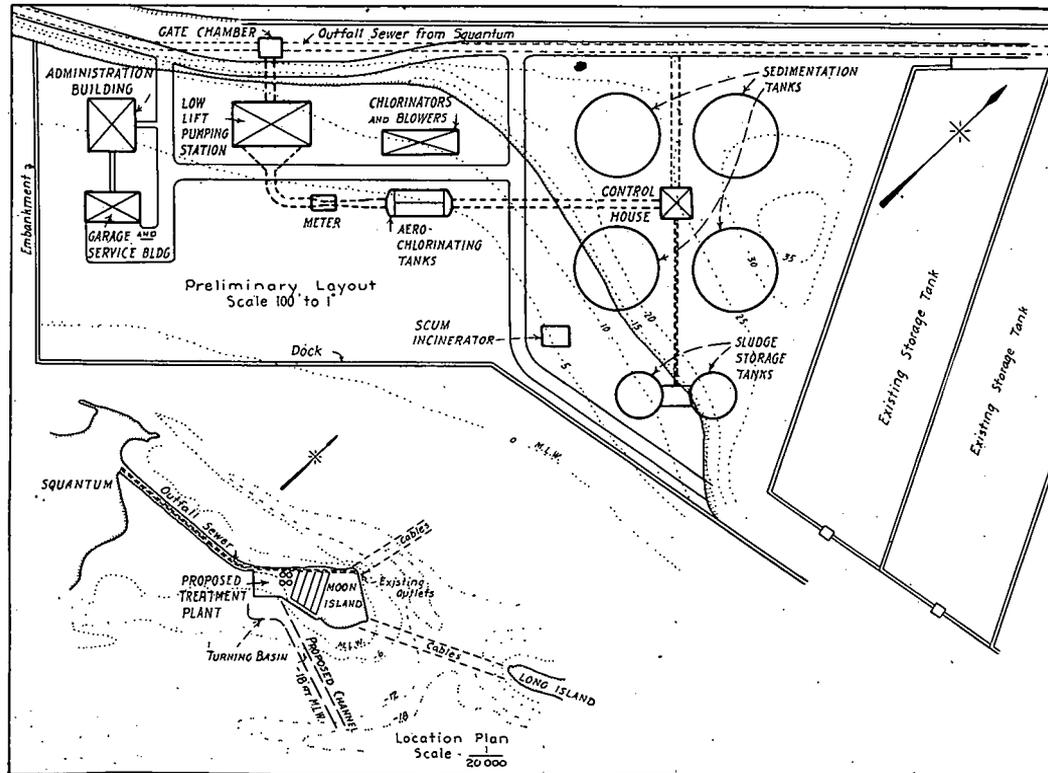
PRELIMINARY LAYOUT OF SEWAGE TREATMENT PLANT AT MOON ISLAND
